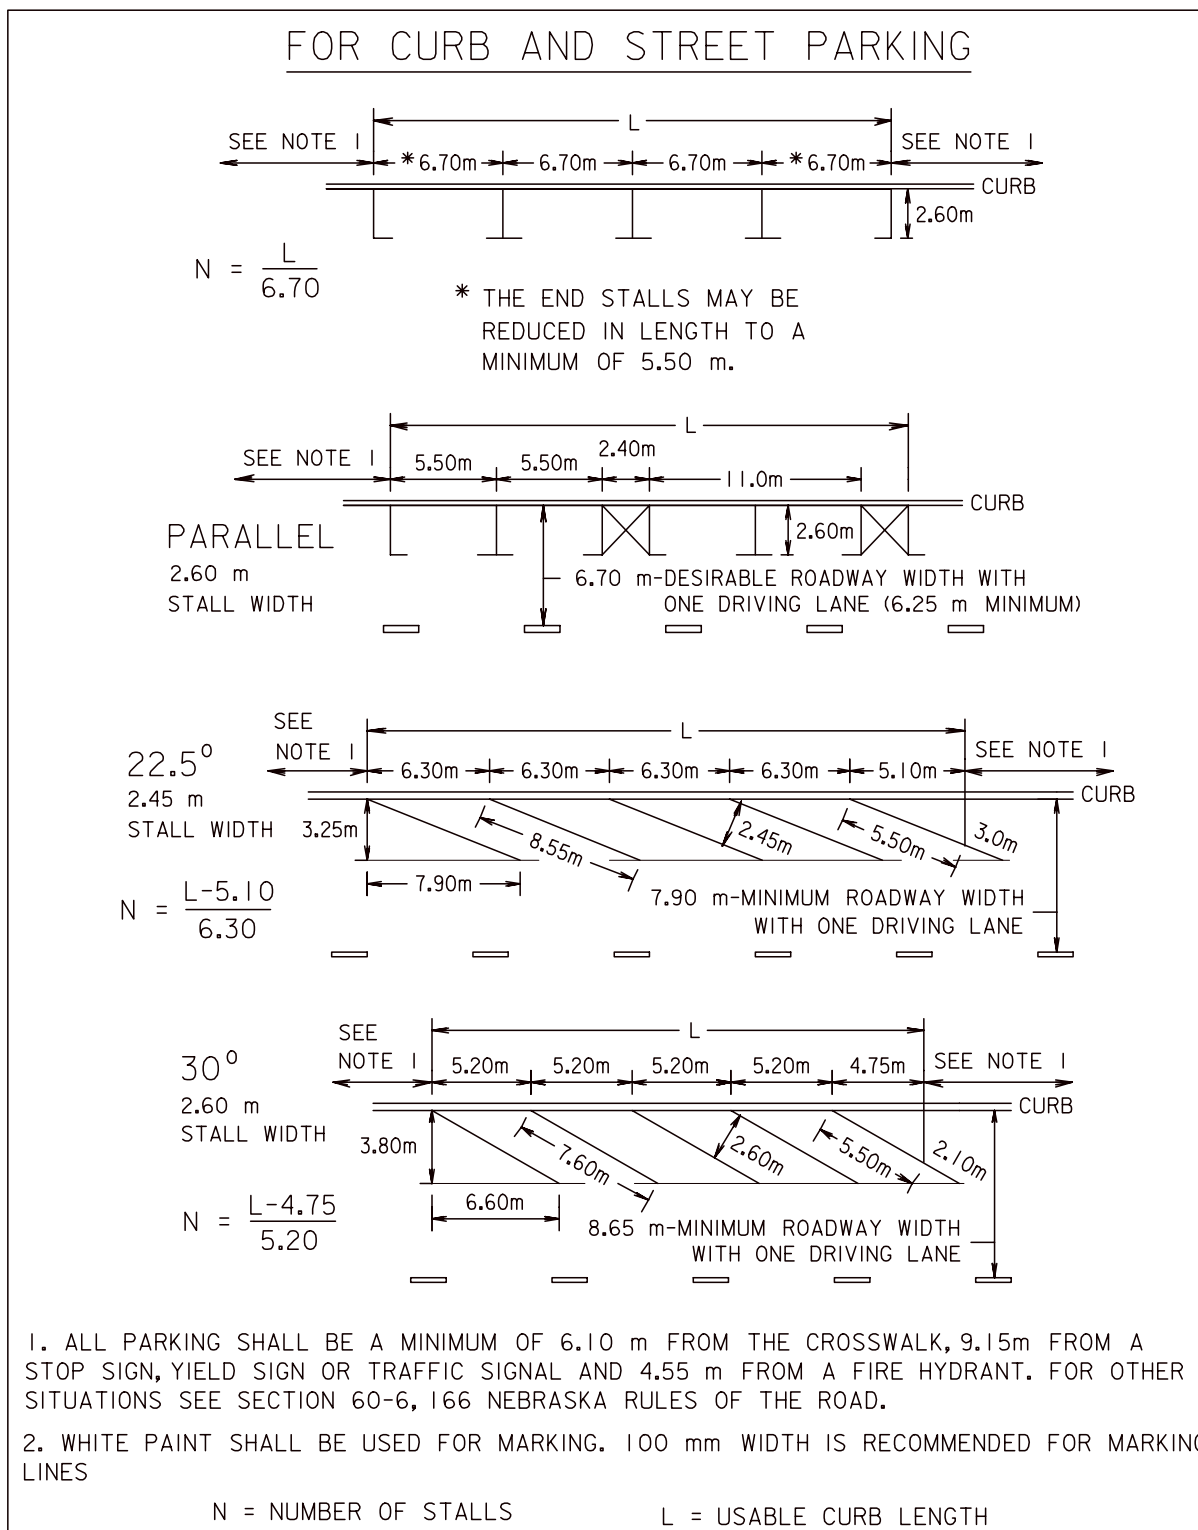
Parking Stall Dimensions for Curb and Street Parking (Metric)
